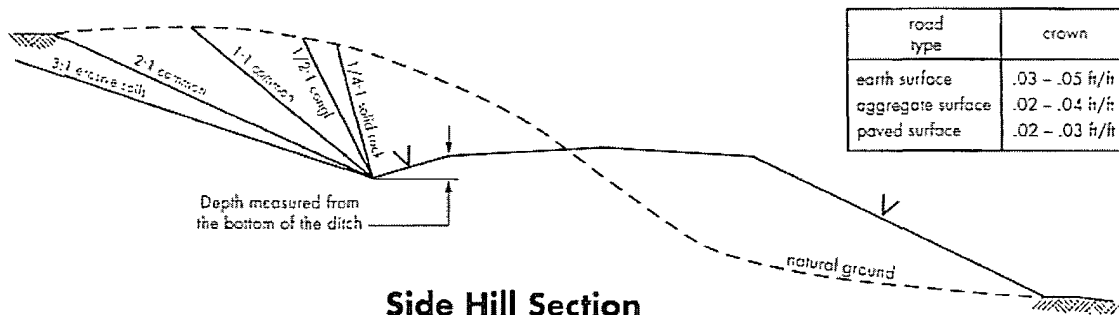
Cross Sections and Plans For Typical Road Sections
